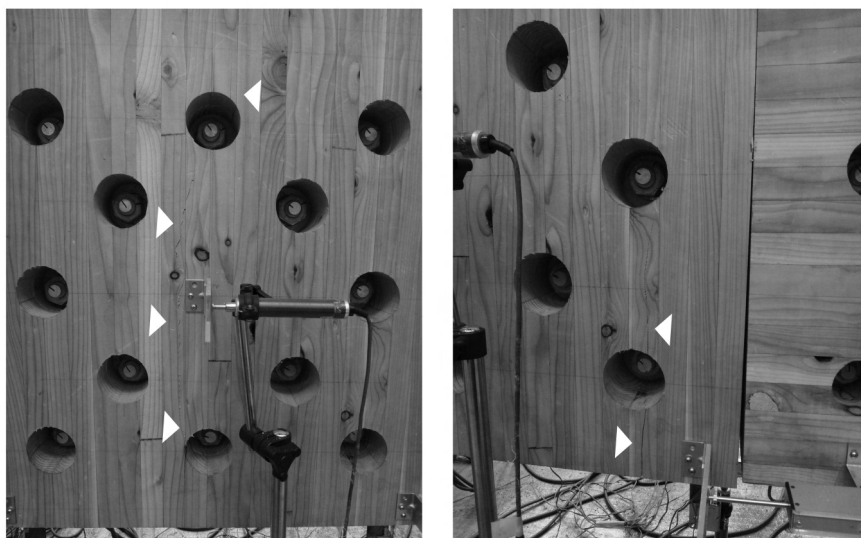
Shear cracks at pre-drilled hole periphery
